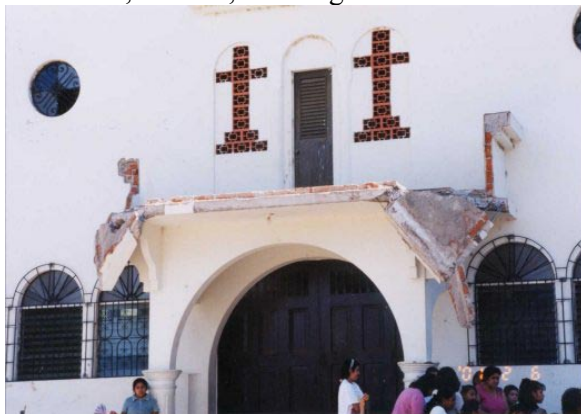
Failure of a unreinforced masonry parapet. The slab also shows insufficient reinforcement.
